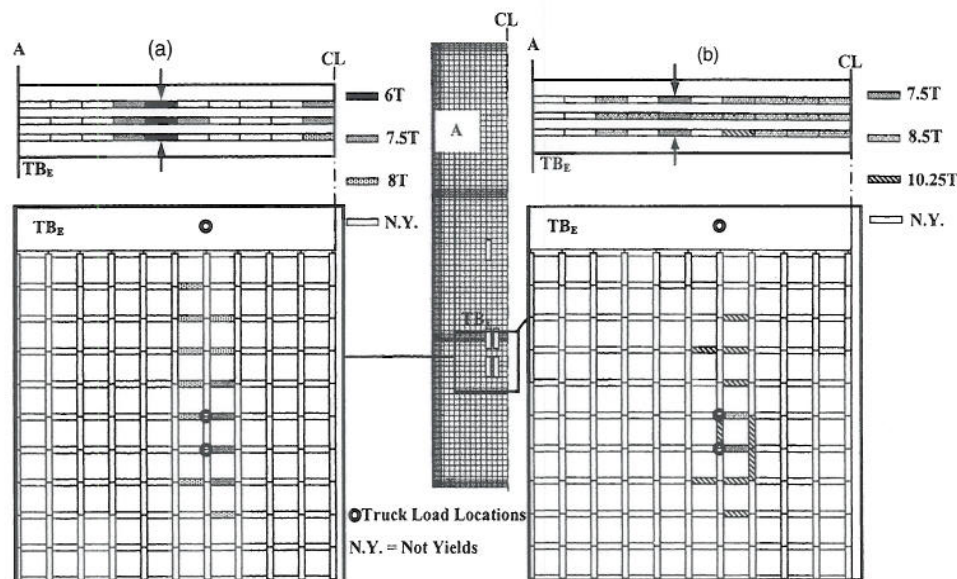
Yielding in reinforcing steel: (a) unstrengthened bridge and (b) fiber-reinforced polymer-strengthened bridge
